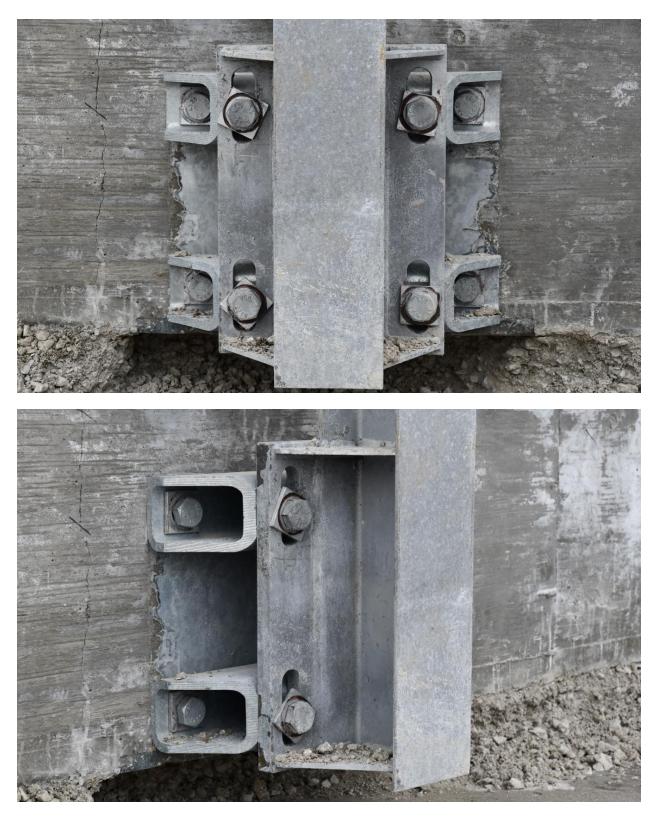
Side-Mounted Post-to-Deck Connections, Test No. STBR-1
